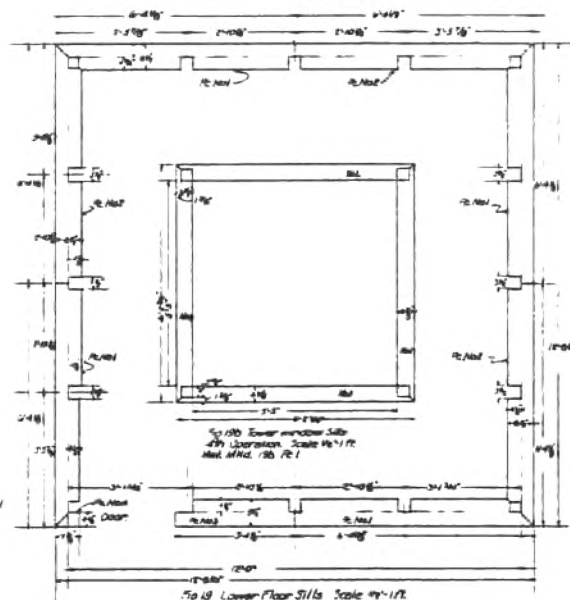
Lower Floor Sills Scale 1/4"=1 ft
